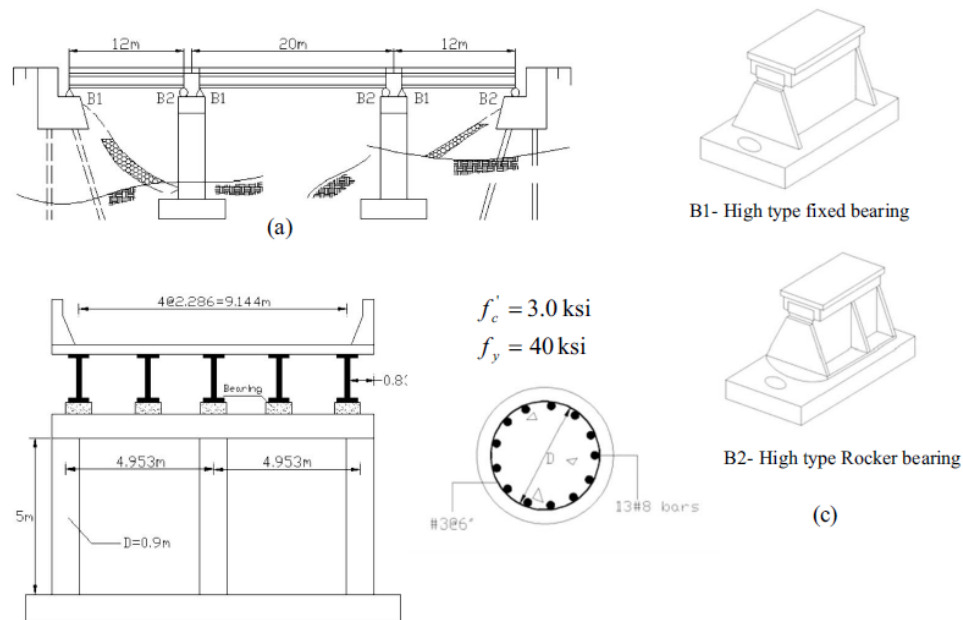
Configuration of a typical MSSS steel girder bridge (Pan et al., 2010b)
